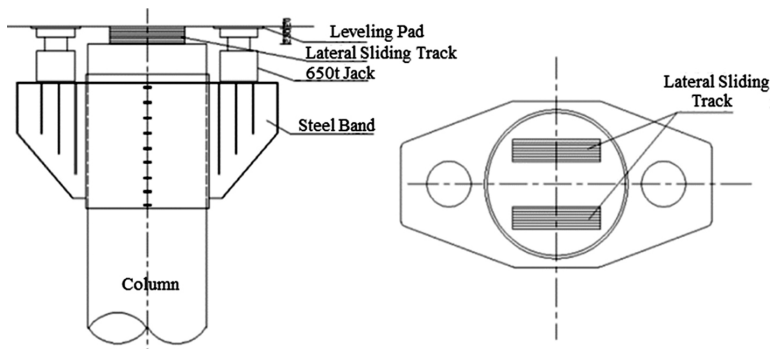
Arrangement diagram of beam resting on piers on the sliding track (single-column pier)
